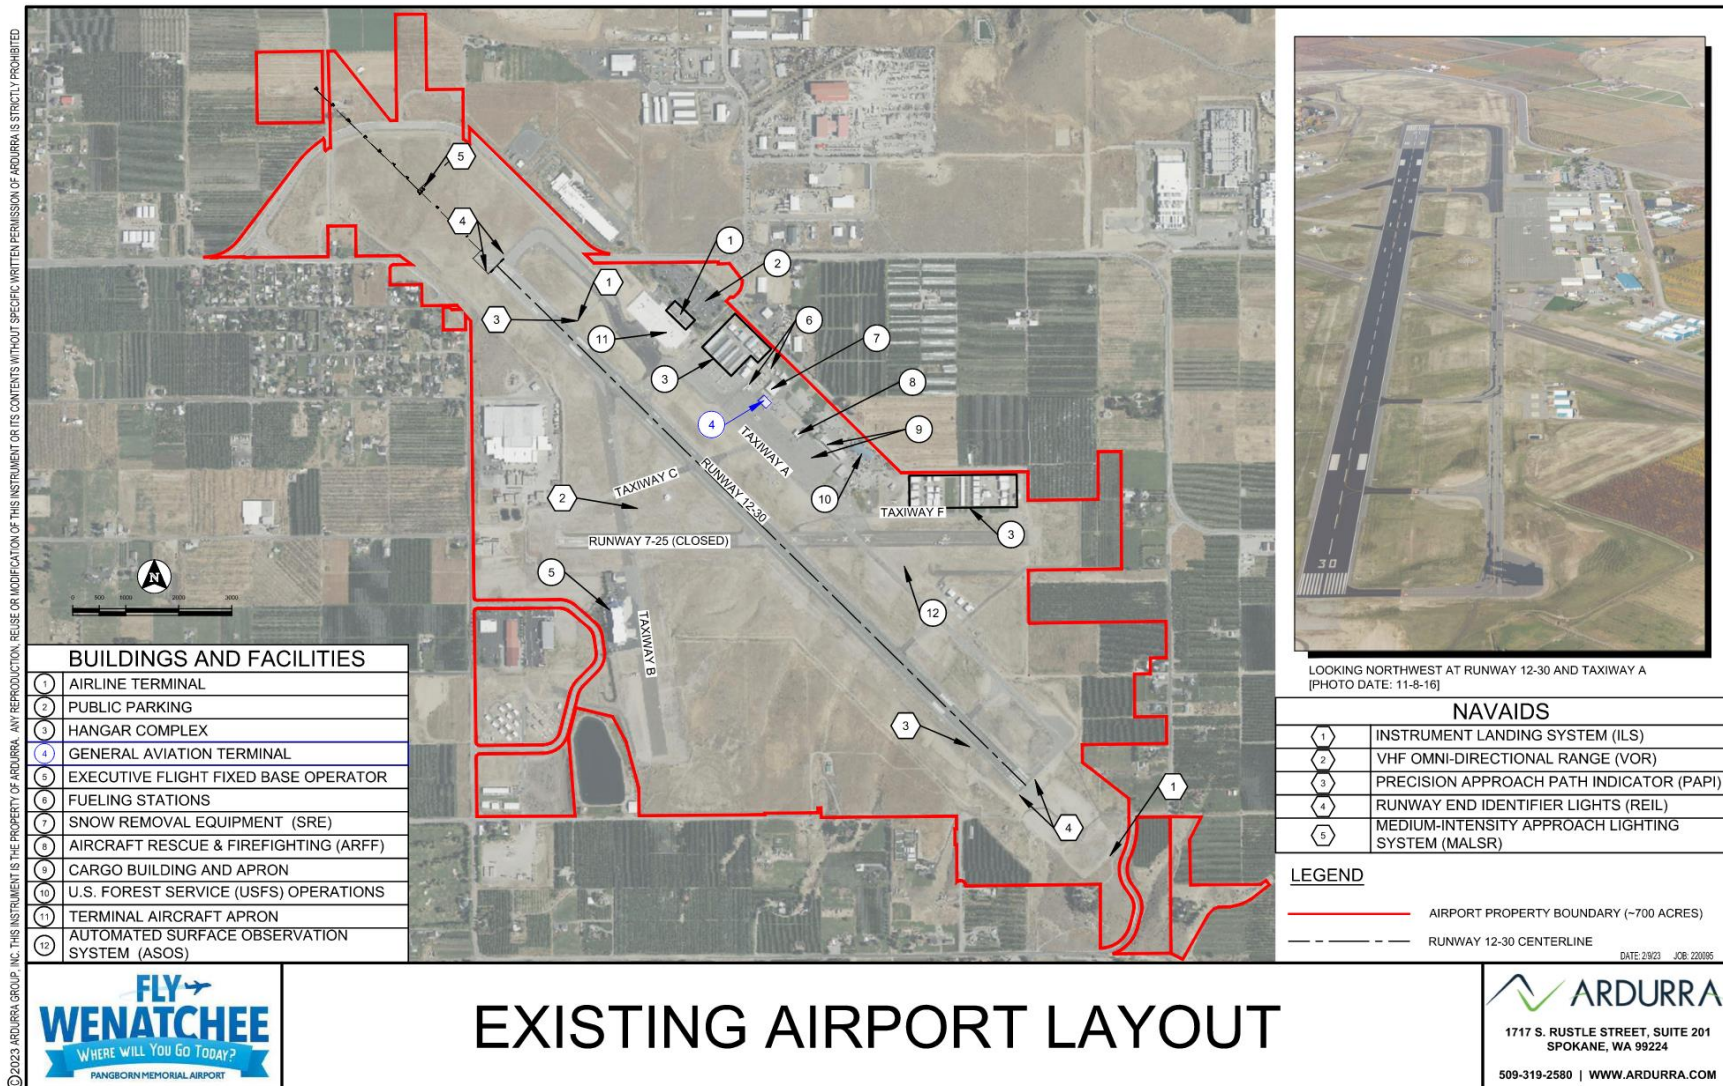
Existing Airport Layout Exhibit – GA Terminal Building is # 4 shown in blue.
